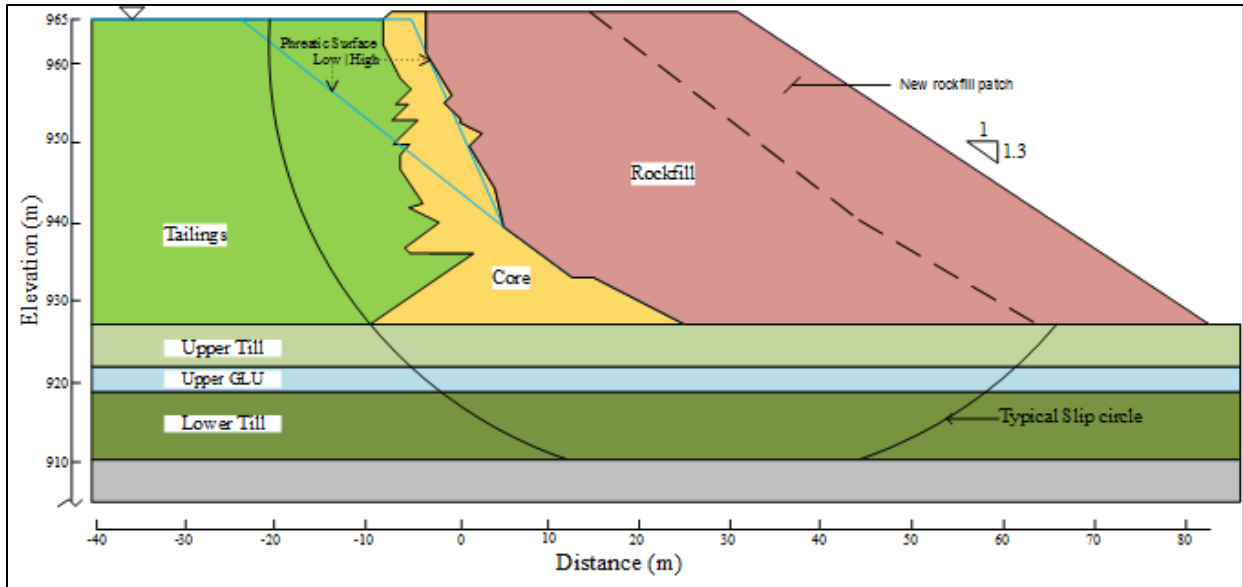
New rockfill patch added to the downstream of the perimeter dam
